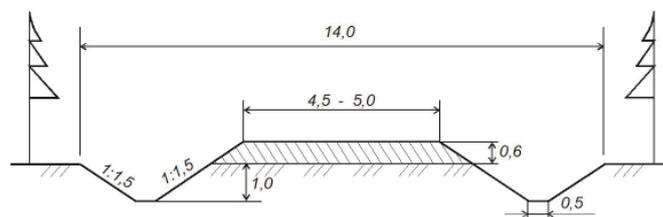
Cross-section structure of an earth fill erected by an excavator from side ditches, m
